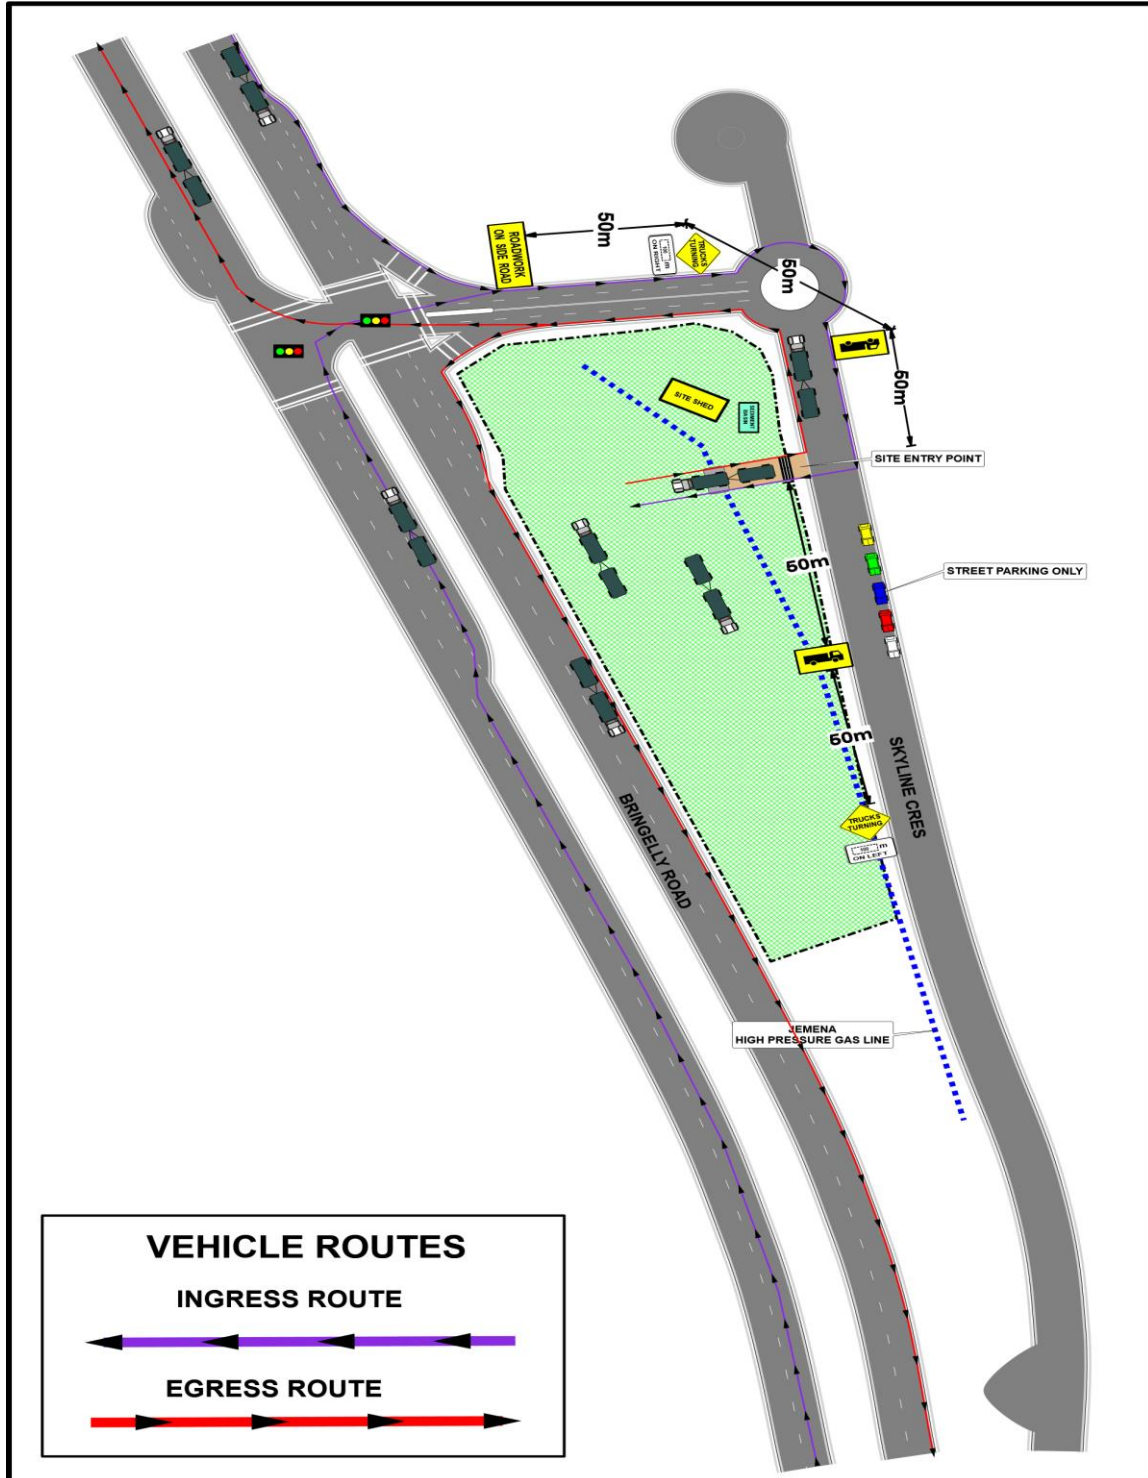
TRAFFIC CONTROL PLAN FOR INSTALLATION OF LONG-TERM SIGNAGE
